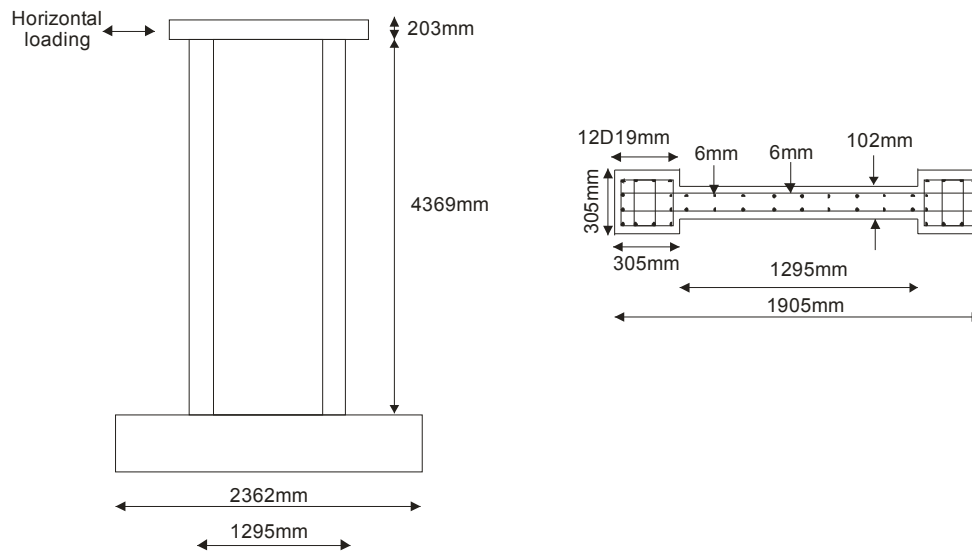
Wall geometry and reinforcing details for Oesterle B8
